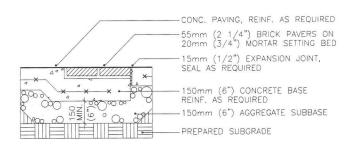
Concrete mowing strip. Concrete strips may be tinted or textured to create neat trim for turf and garden areas.
